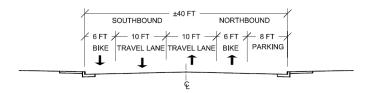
Revised Proposed Cross Section between Church Street and Centre Street
